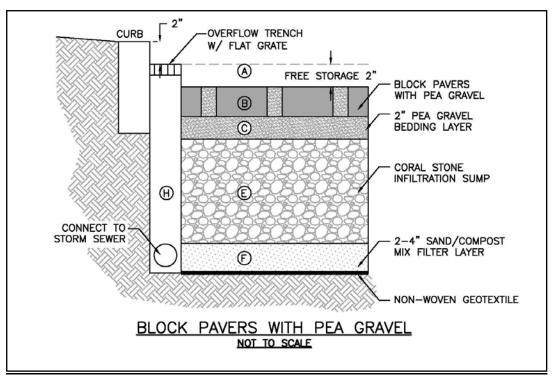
Cross-sections for Permeable Interlocking Concrete Paver (PICP) <u>infiltration</u> design version (no underdrain).
